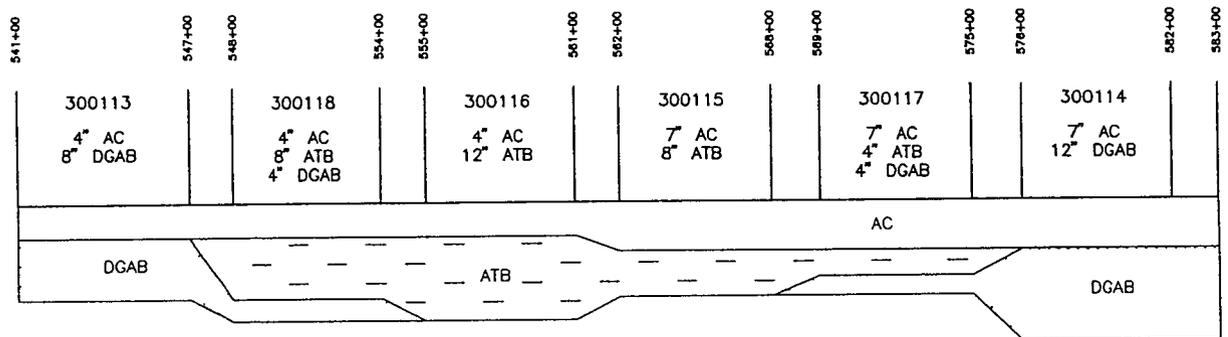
illustrates the ordering and combination of experimental SPS-1 test section pavement structures to be constructed. Construction stations are shown in this figure. Stylized transitions in the pavement structure are shown between the test sections.
